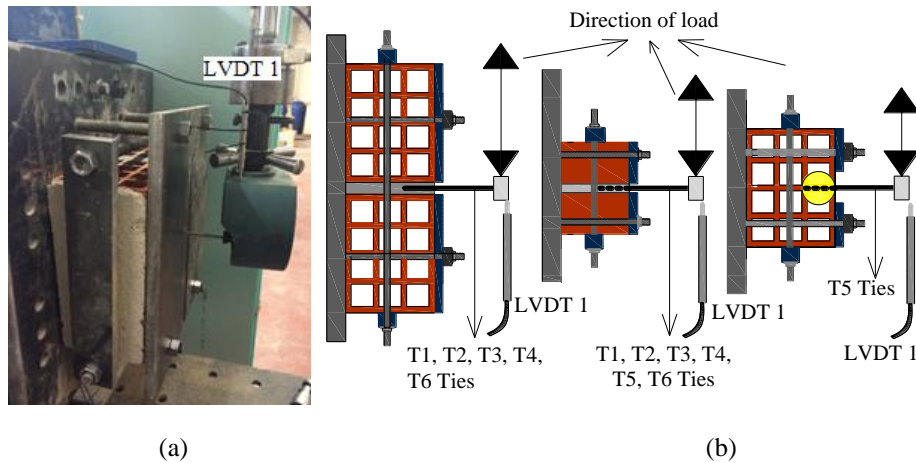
Details of shear tests for single assemblages: (a) test setup and (b) representative scheme of test setup
